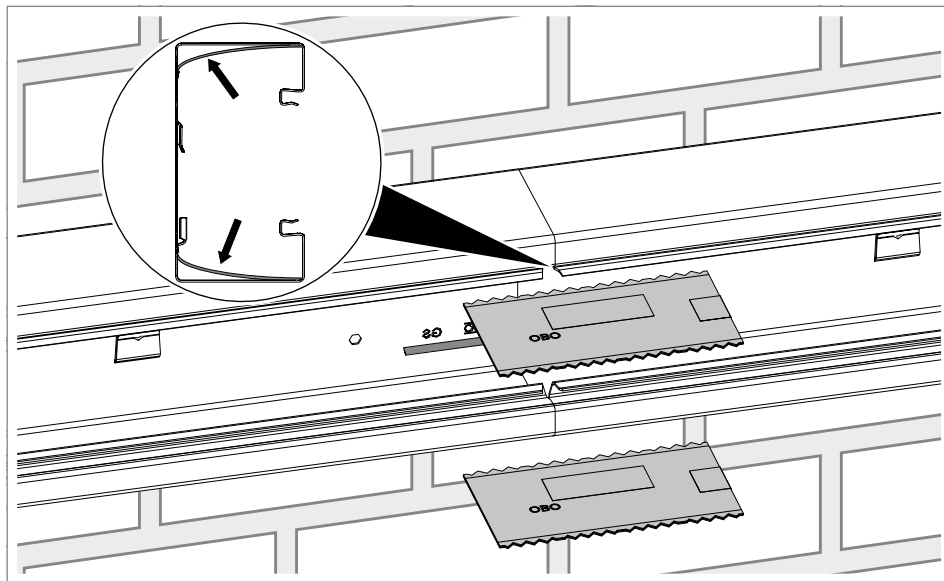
Connecting device installation trunking Rapid 80® GS/GA
